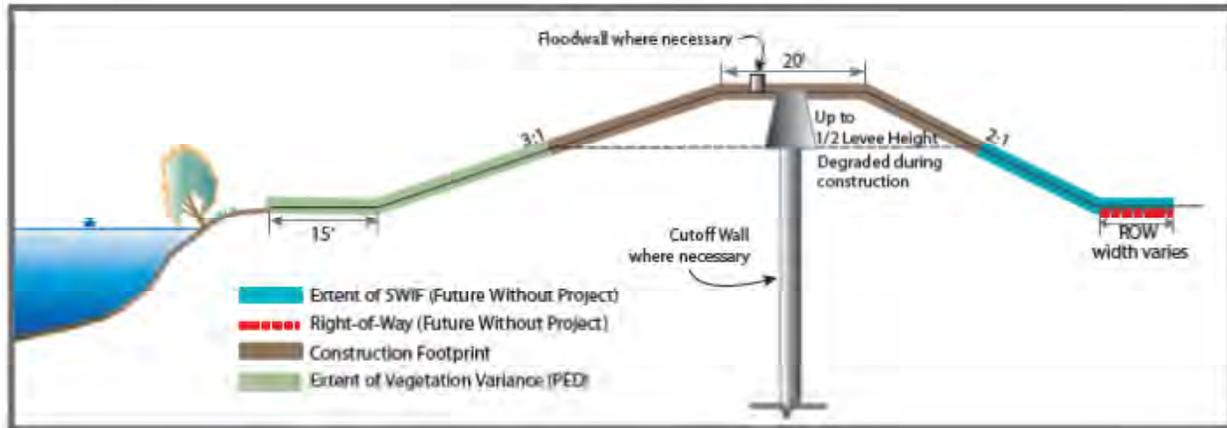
Conventional Open Trench Cutoff Wall or Floodwall Scenario.
